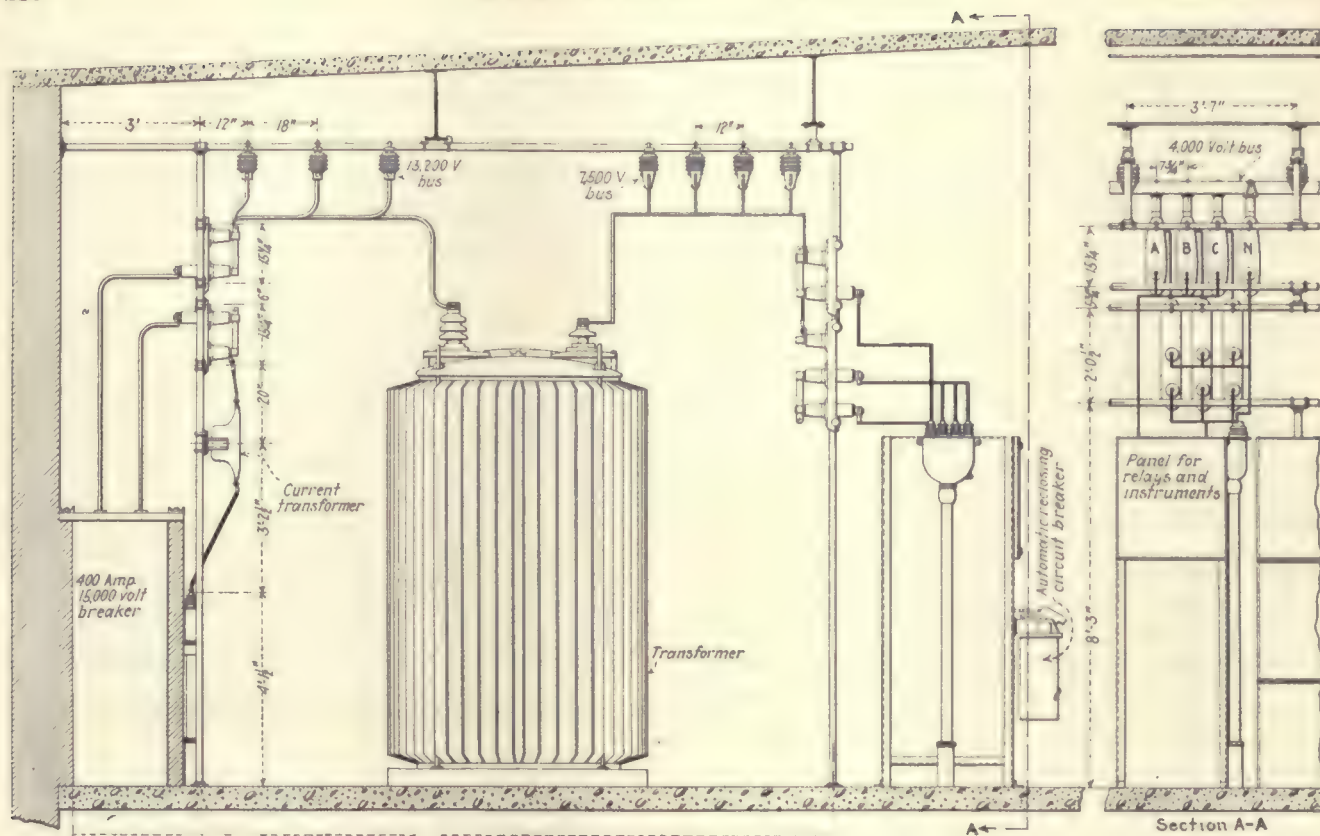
, A AND B—"DISCONNECTS" ARE ARRANGED SO THAT ANY FEEDER BREAKER MAY BE SHUNTED OUT OF SERVICE FOR INSPECTION AND REPAIR
